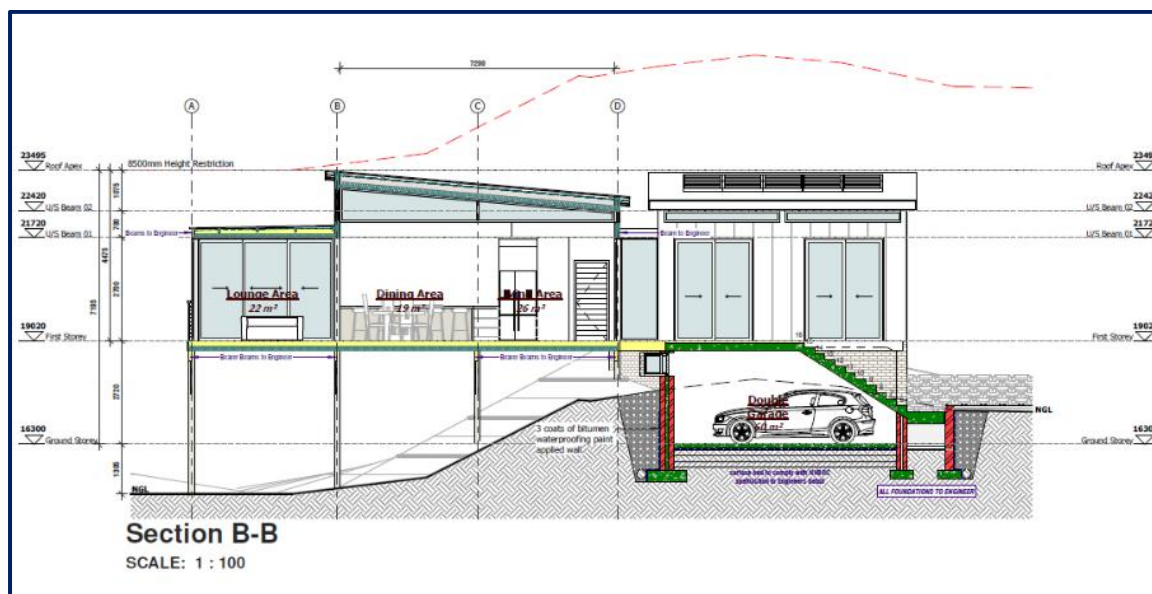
Design and layout of the proposed dwelling on erf 1363 (Pure Design; drawing number:100, August 2023)
